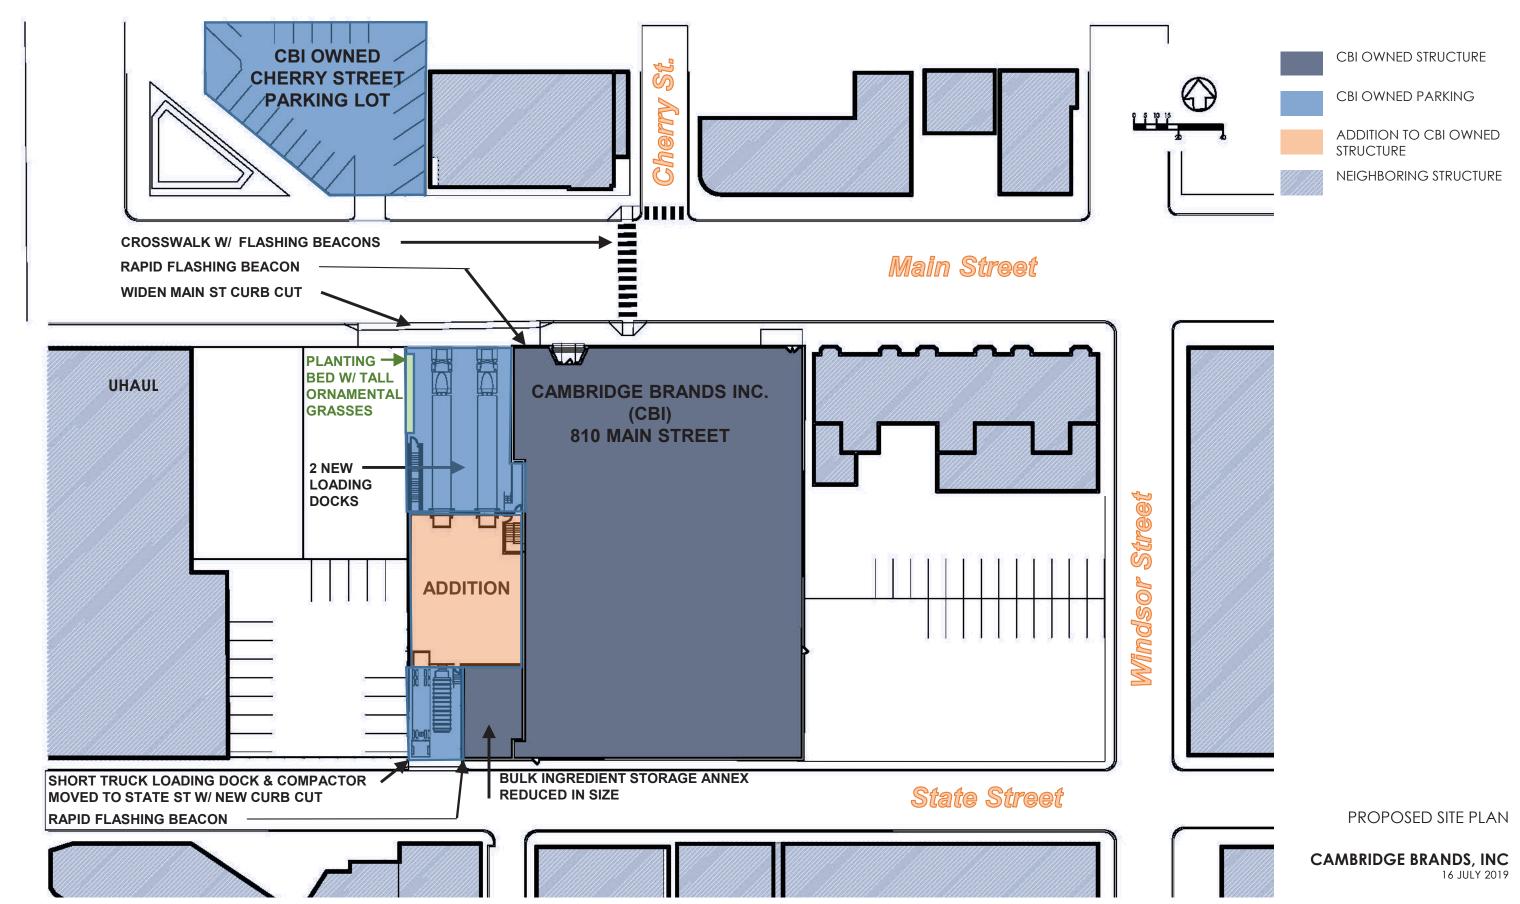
SITE PLAN: PARKING ANALYSIS
